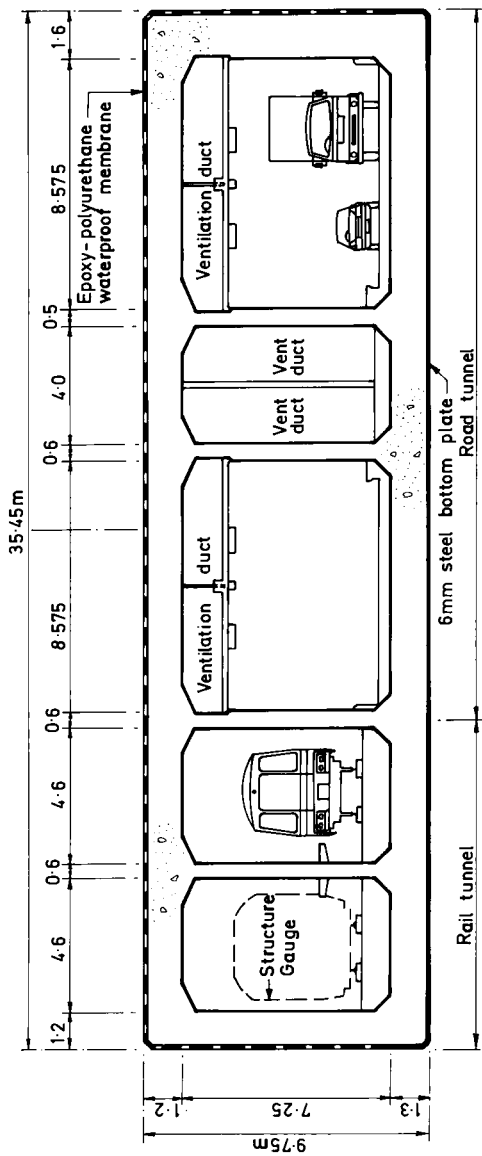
Rectangular concrete box tunnel (Eastern Harbour Crossing)
